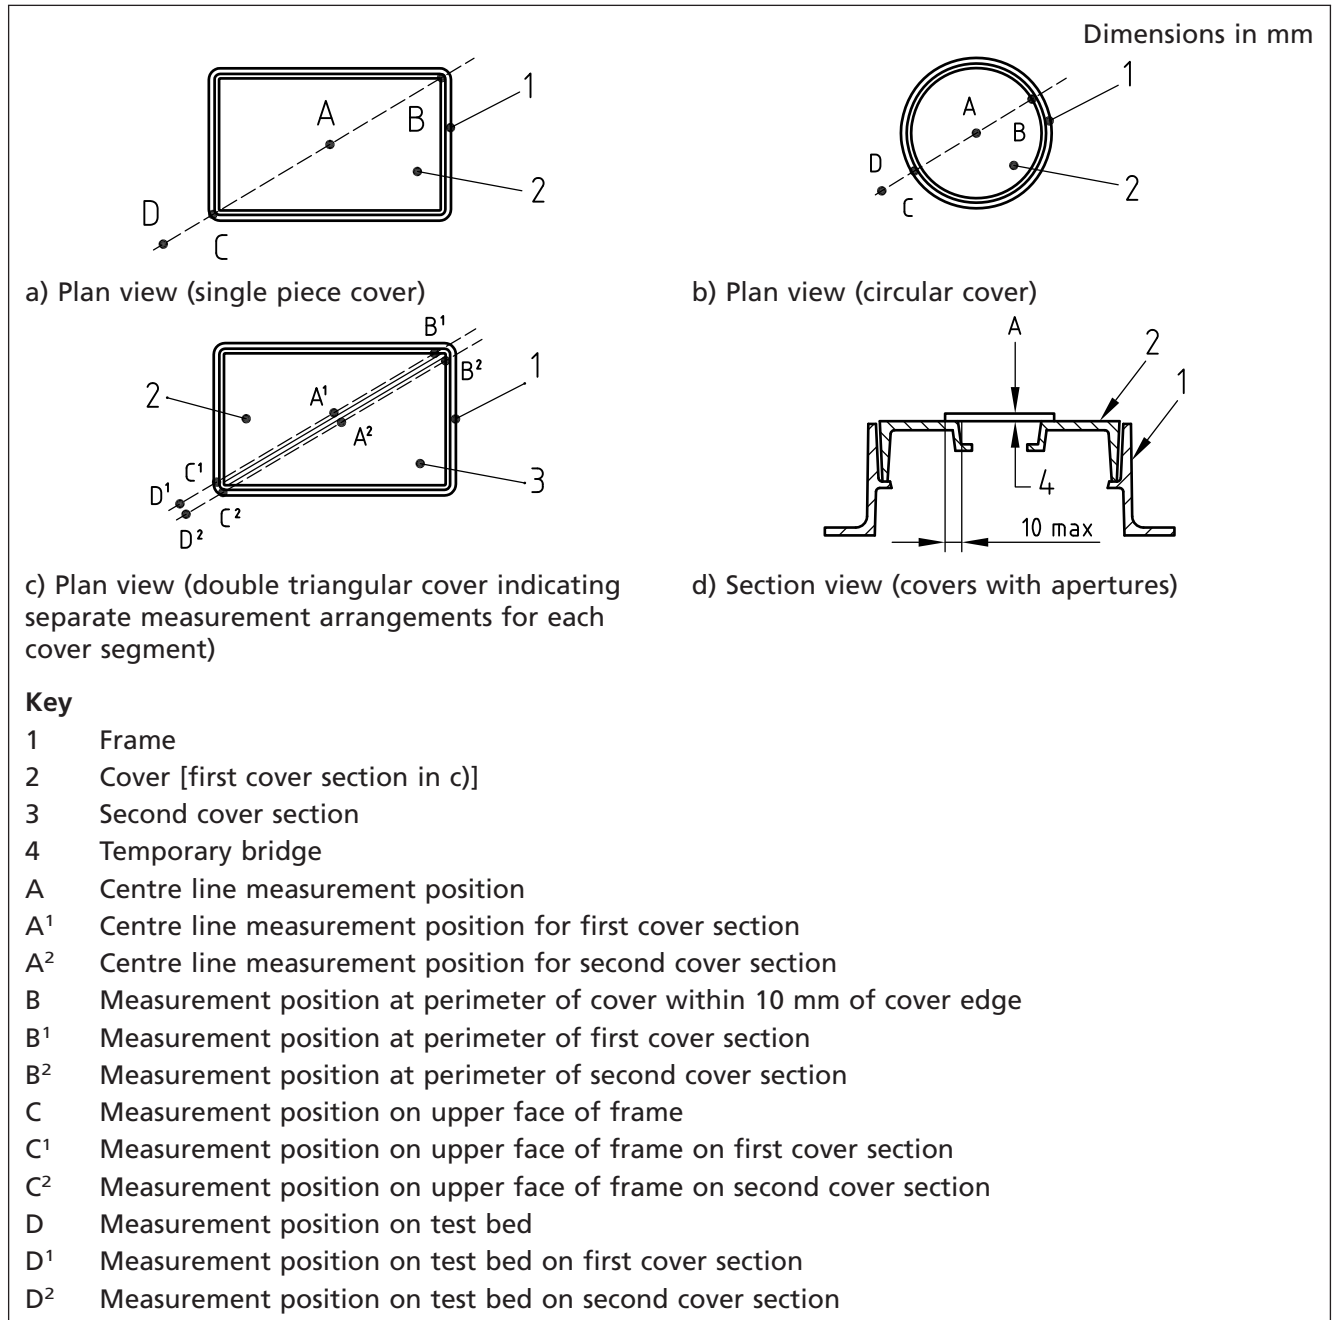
Views of cover and frame assemblies illustrating measurement positions
